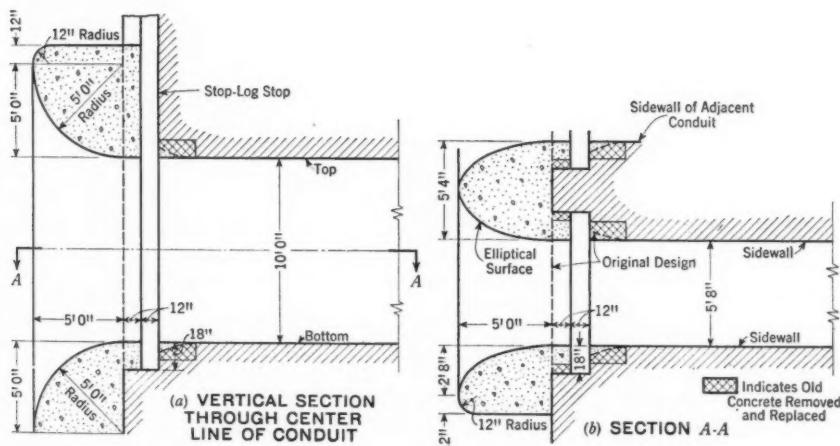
BELLMOUTH ENTRANCE AT CONDUITS 5 AND 6, MADDEN DAM
